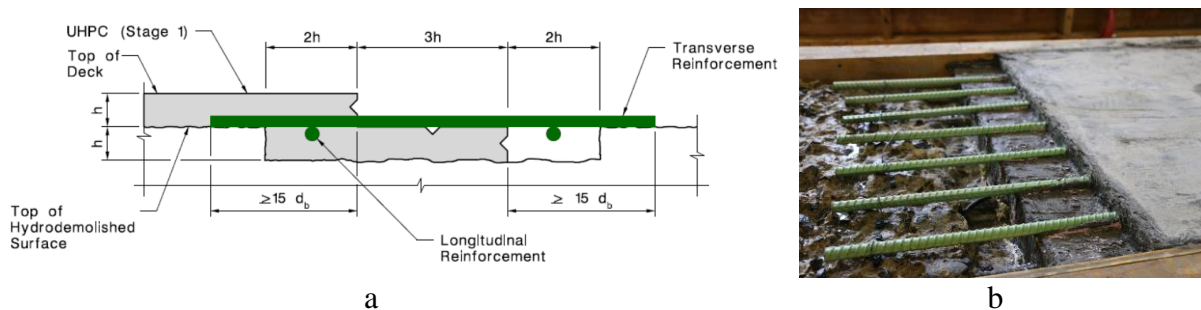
a) detailing of cold-joint between staged UHPC construction (Haber et al. 2022) and b) photograph of cold-joint tested within this study
